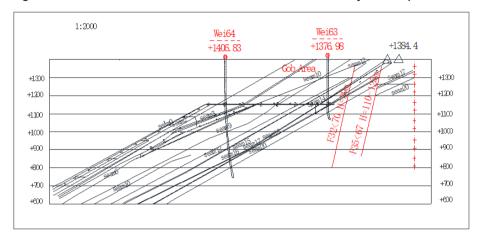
Mine Cross Section with Inclined Shafts and Roadways Development
